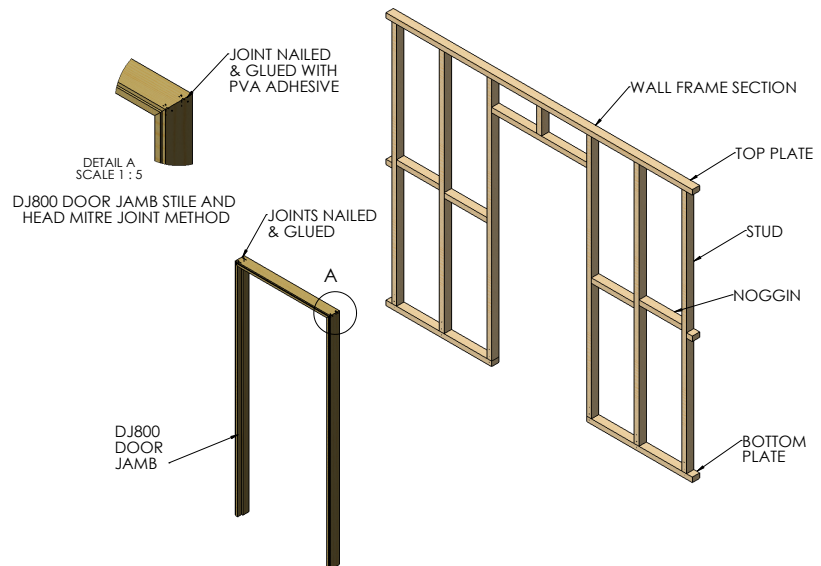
DOOR JAMB ASSEMBLY DETAILS
